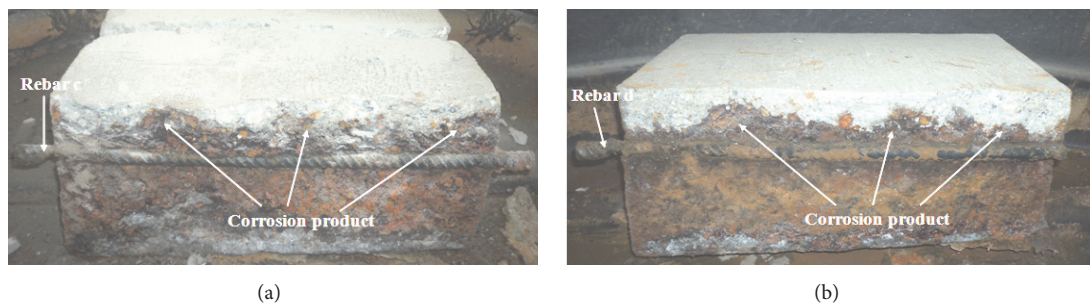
Cut sections of the postcorrosion slab: (a) rebar c and (b) rebar d.
